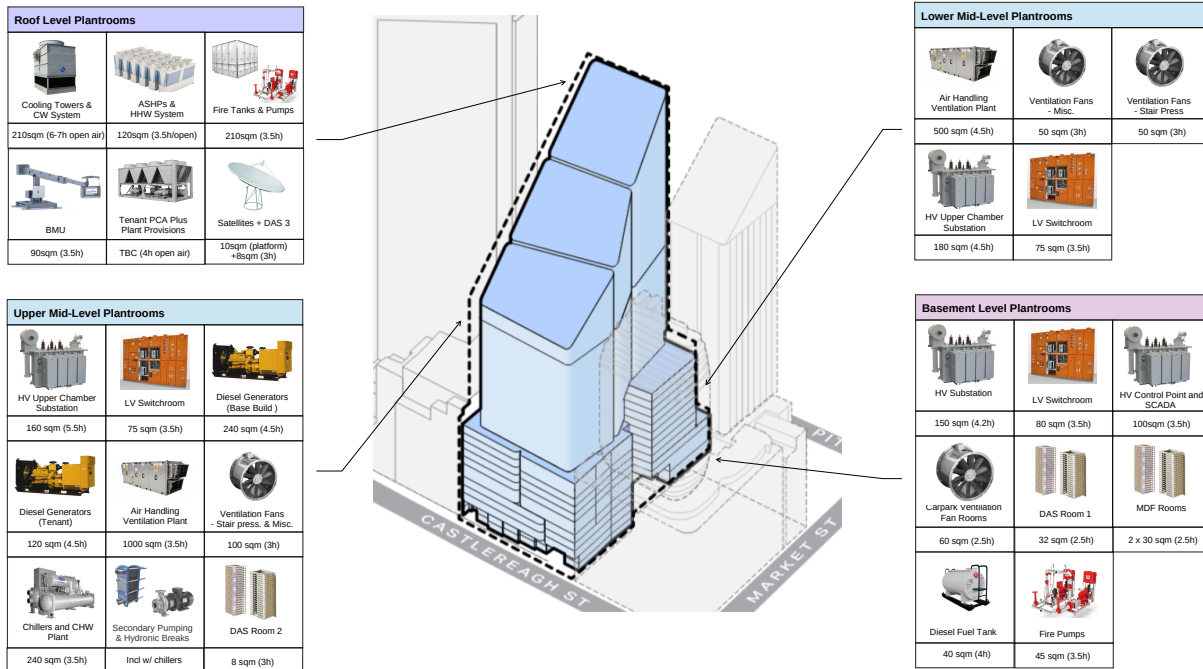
133 Castlereagh Street Tower Plantroom Massing (Commercial Scheme)
